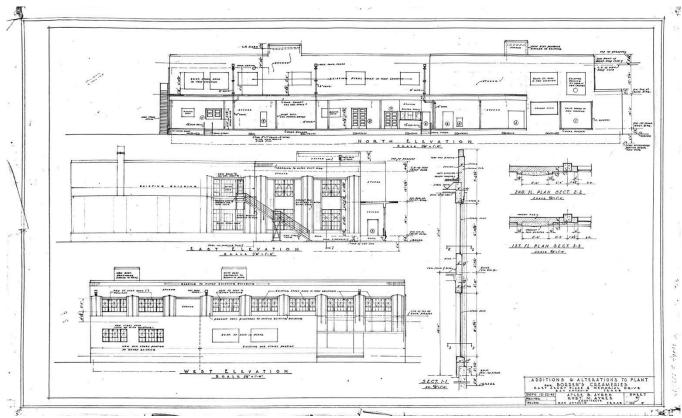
Historic Plans Showing c.1949 Addition on East Elevation, June 7, 1948.
